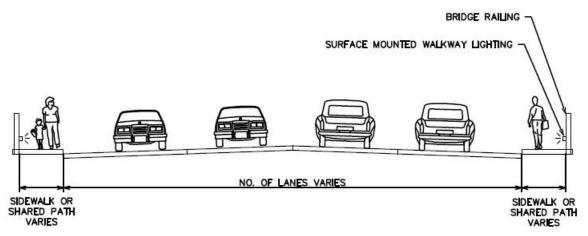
Typical Section of Walkway Lighting Added to Existing Crossing
